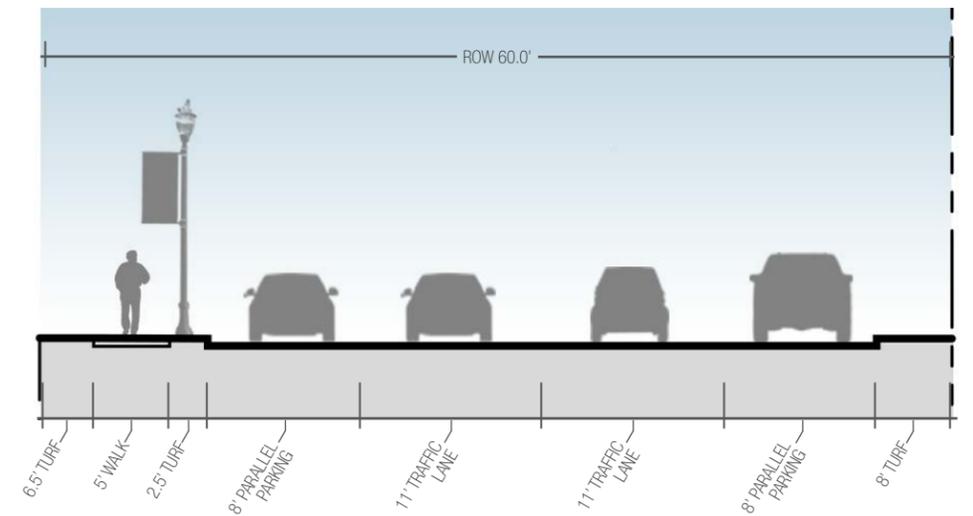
PROPOSED 64TH TERRACE SECTION AND PLAN
